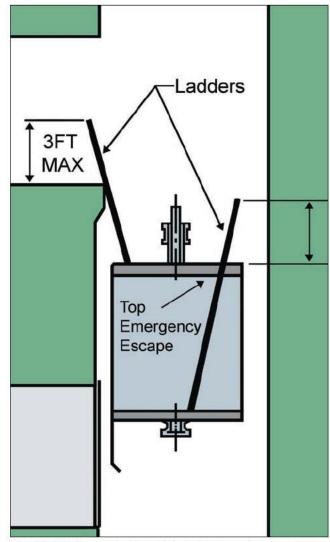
A small ladder (attic ladder) can be placed into the elevator car, allowing victims to climb out to a floor above, if necessary.
